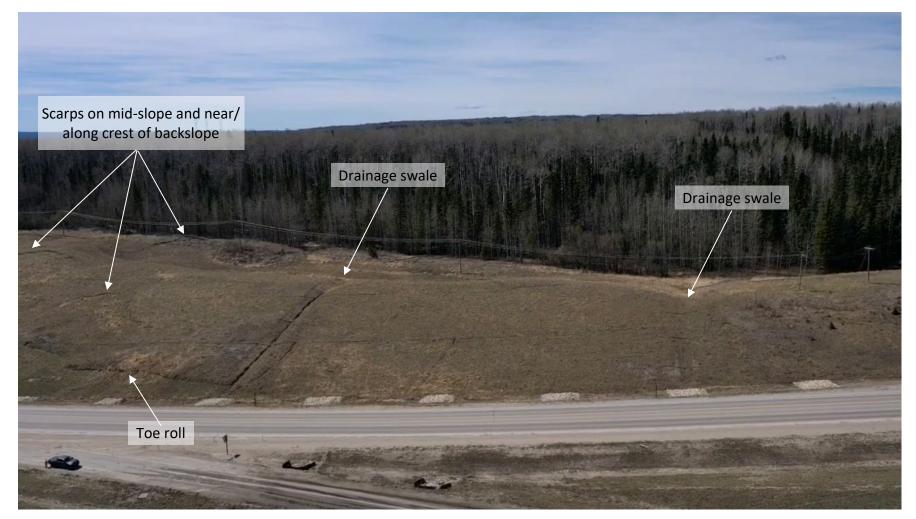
Scarps on mid-slope and near/along crest of backslope. Note rill and small gully erosion on backslope and in drainage swale. Photo taken with UAV on May 9, 2024, facing south.
